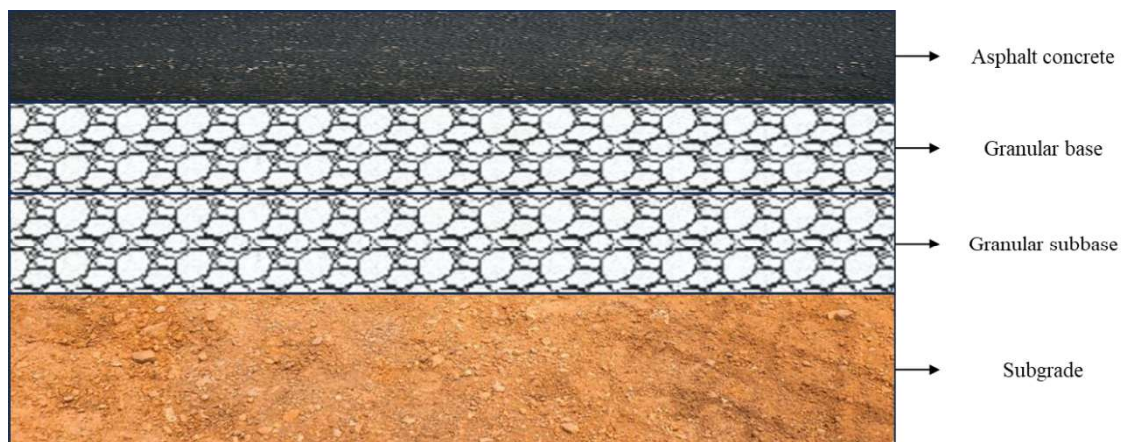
Typical cross-section of asphalt concrete pavement.
